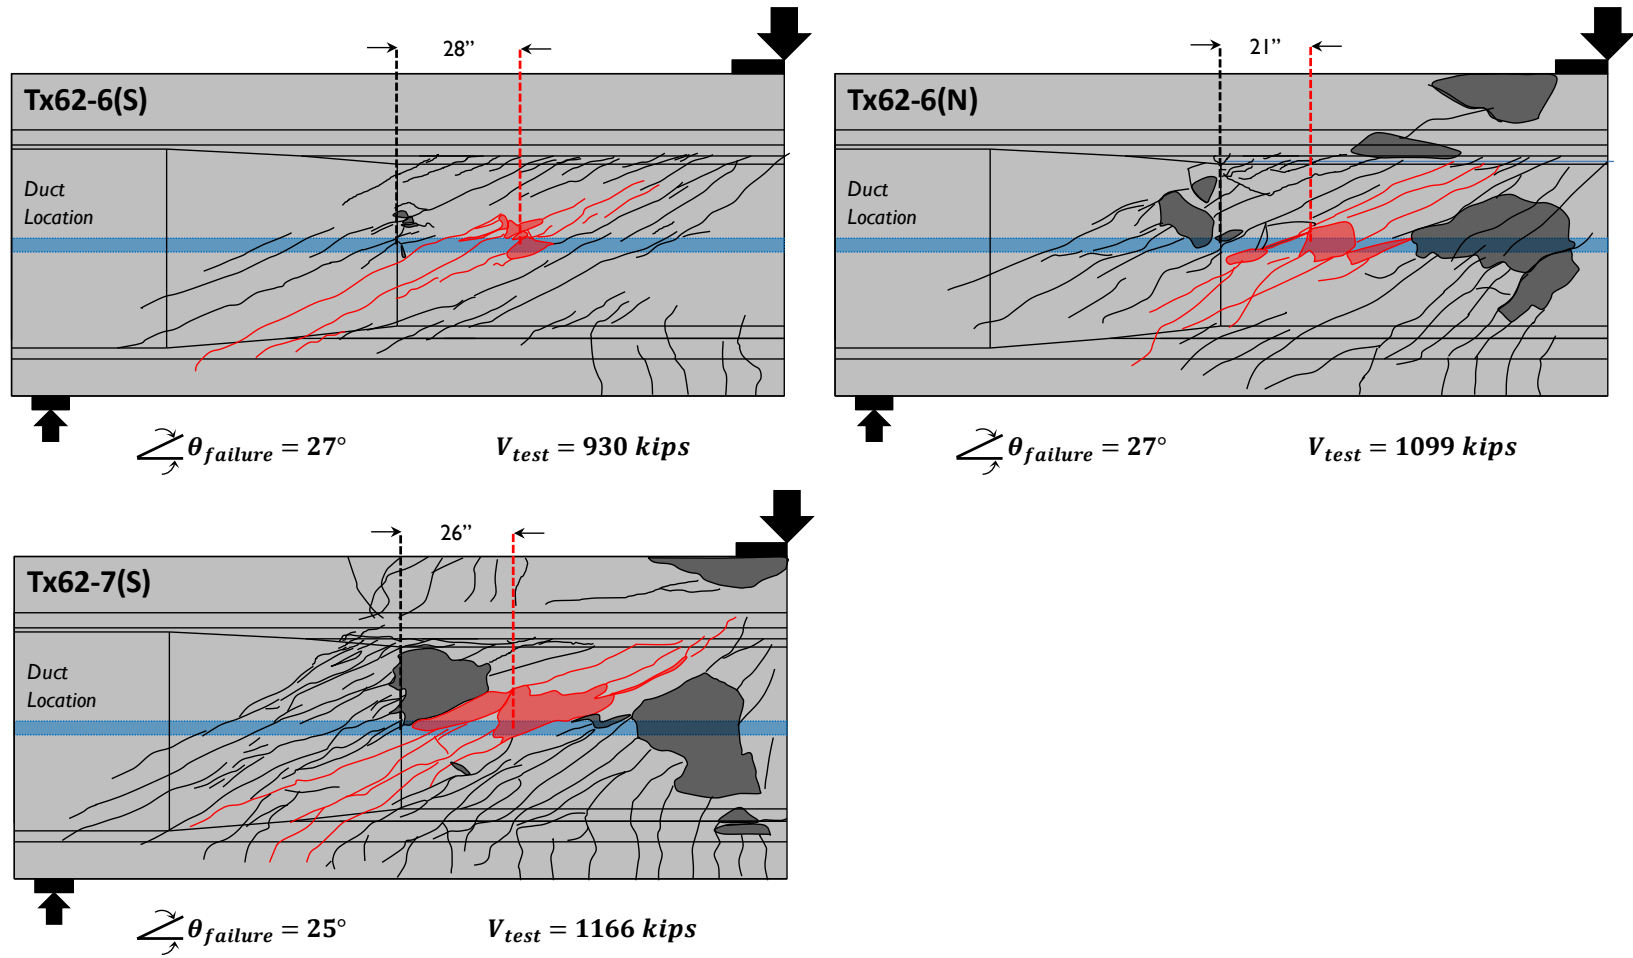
Failure Mechanisms of Test Specimens Primary Failure Cracks in Red (Part 3 of 3)
